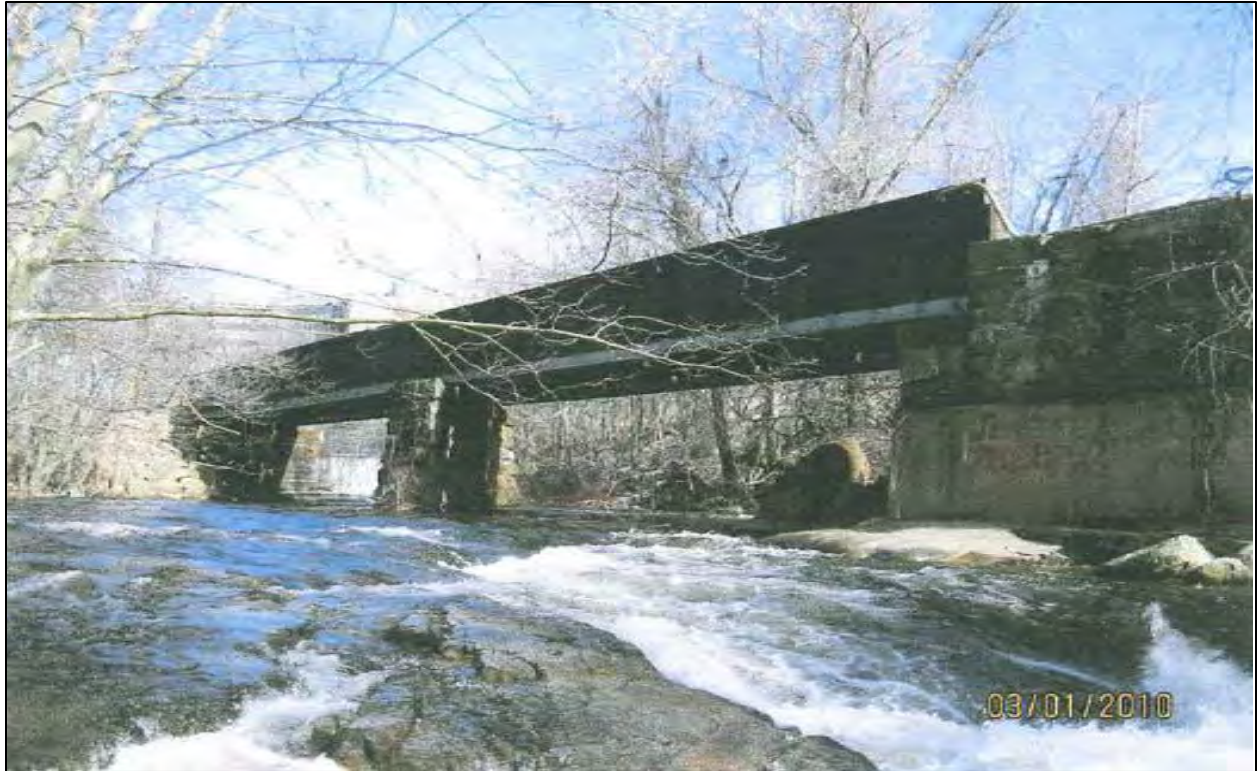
Glover Avenue Bridge (Belden Hill Avenue Bridge, Bridge No. 4155),
